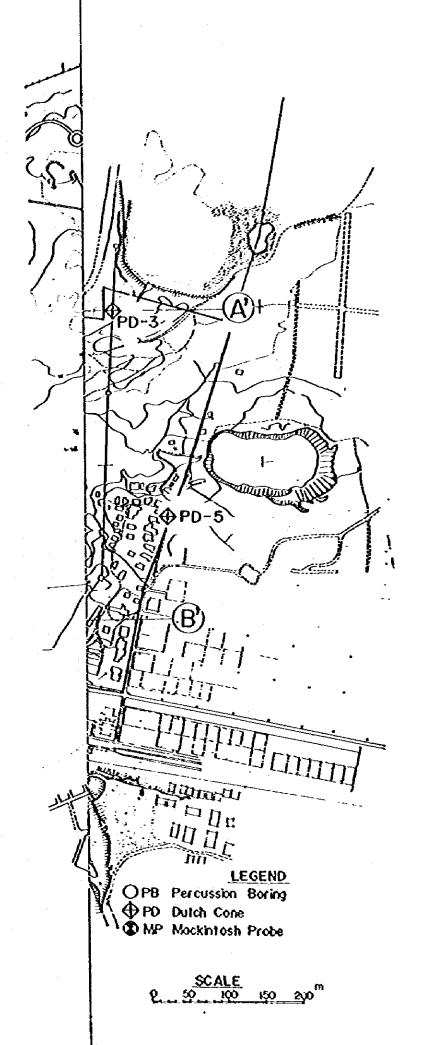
Boring and Sounding Locations at Kampong Pandan Site
